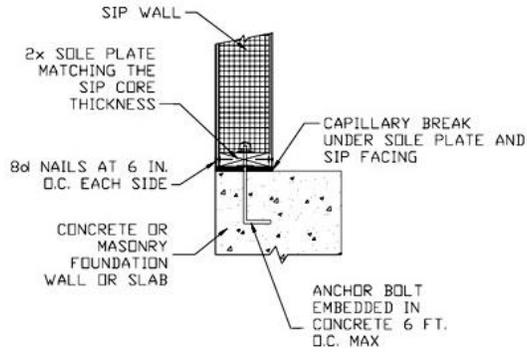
SIP Wall to Concrete Slab or Foundation Wall Attachment (Structural Insulated Panel Association, 2007)
